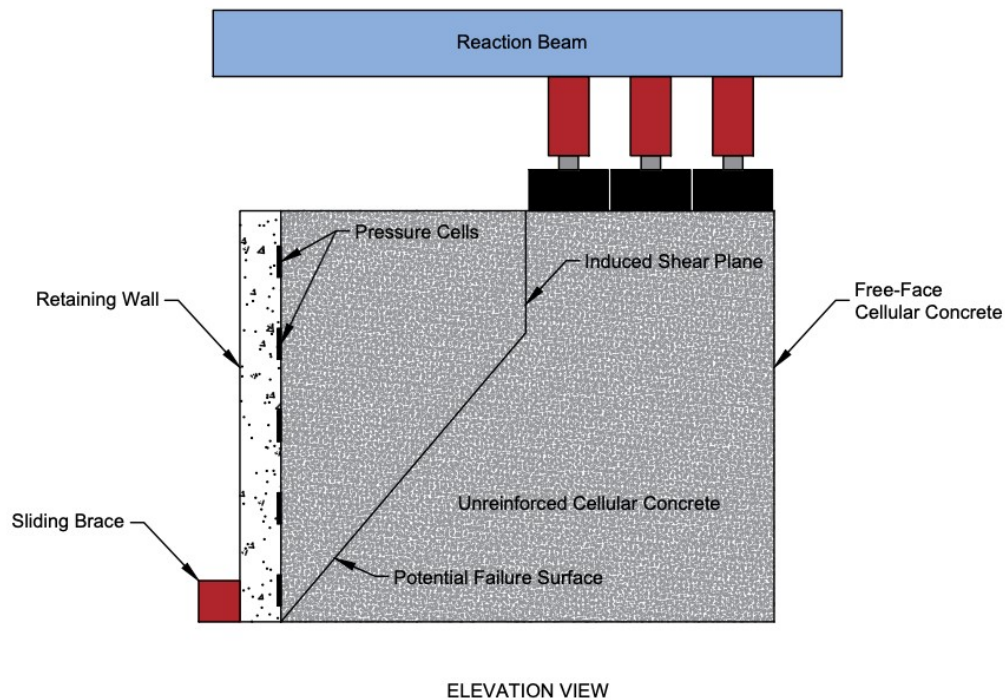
Partial surcharge layout diagram – elevation view
